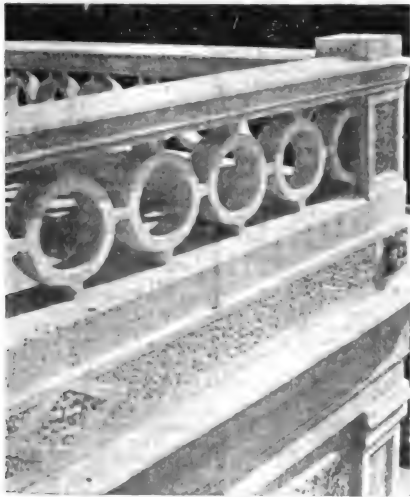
(LEFT TOP)—DETAIL OF FRONT, SHOWING BALCONY BRACKETS, BALUSTER AND CIRCULAR PIERCED PORCH RAIL
